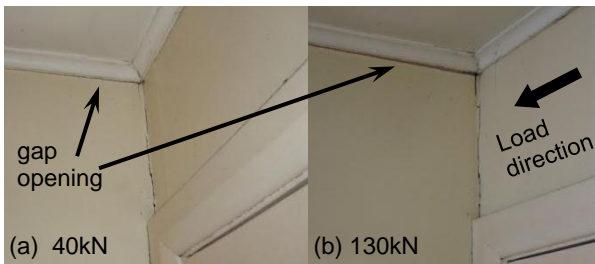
Increased cracking in corner and opening of a gap between scotia and wall while increasing the applied test load, Bexley Rd. Photo: L. Holt
